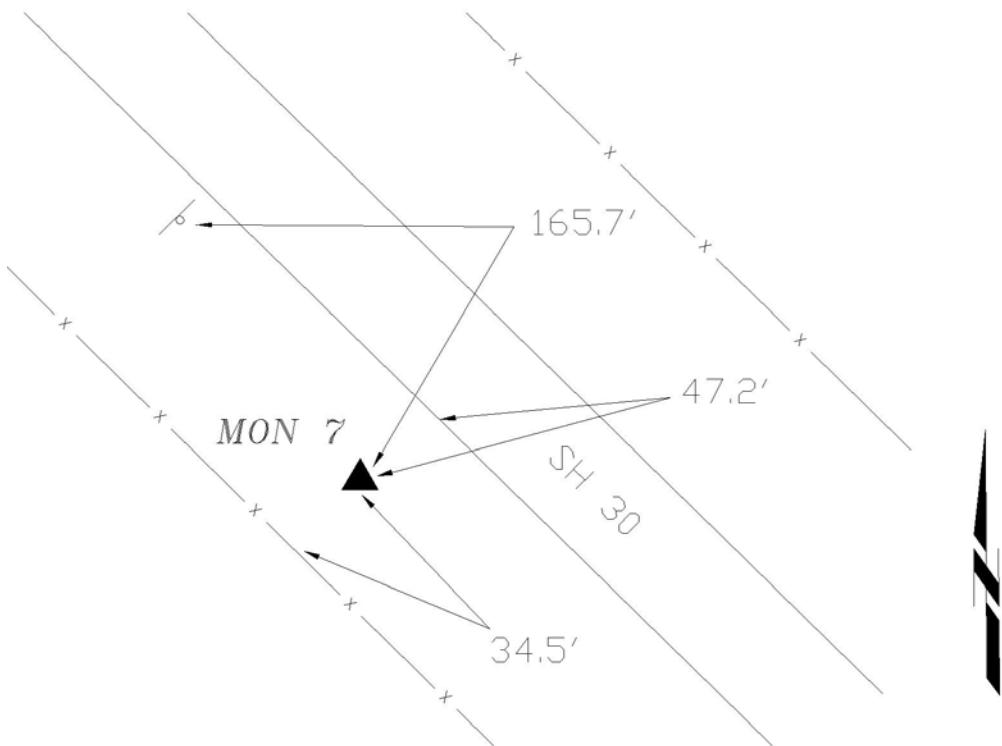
Station Detail	Photo 2 – Station Area Picture
